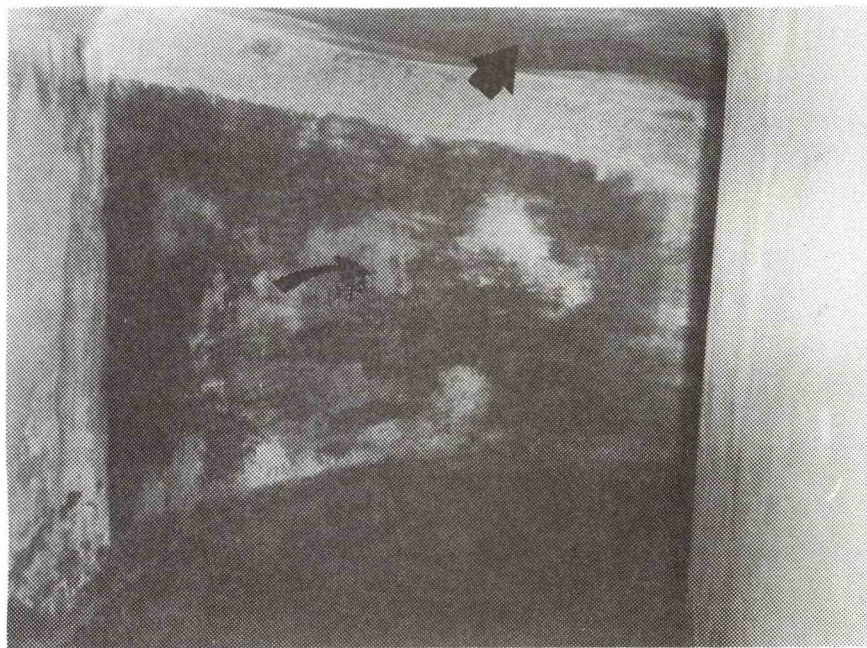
Collection gallery showing gradual 90° turn and smooth shot crete ceiling at Little Goose Dam.
